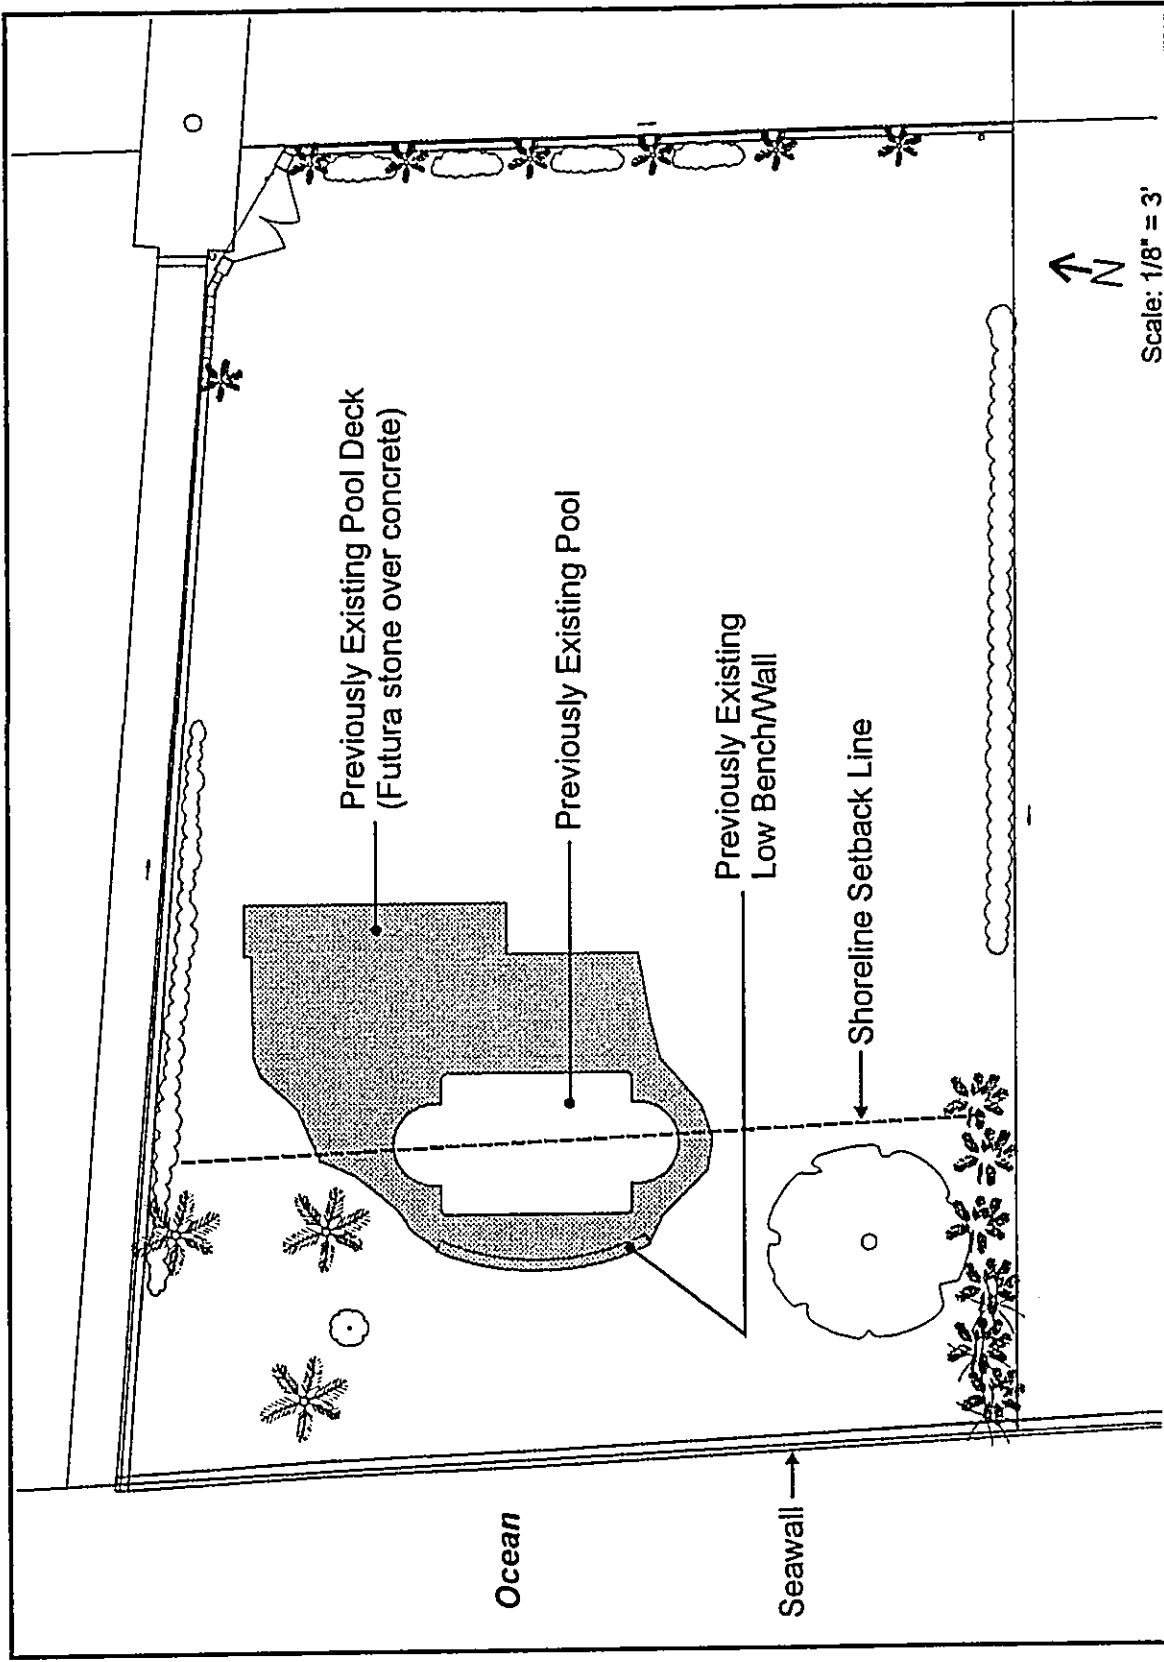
Site Plan Showing Previously Existing Pool and Deck
